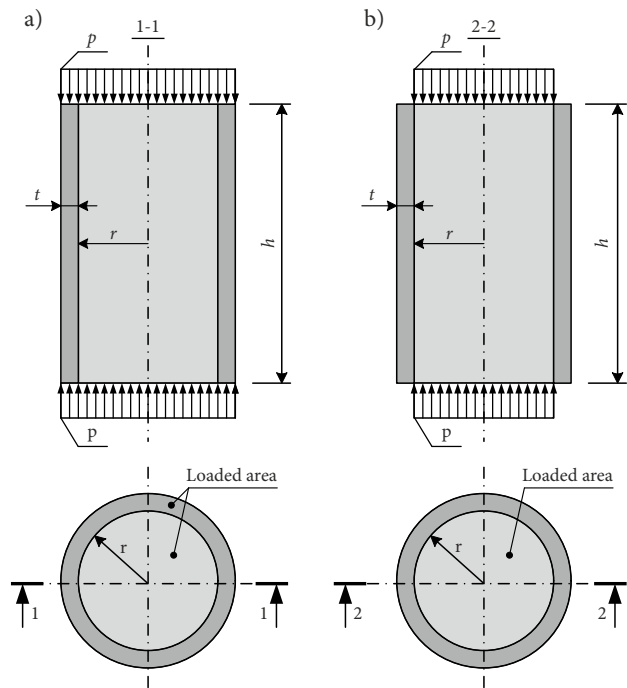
Loading of strengthened specimens: (a) – loading through the whole surface; (b) – loading through the internal concrete core. Here designations p – external load pressure; t – thickness of external jacket; r – radius of internal concrete cylinder; h – height of the specimen
